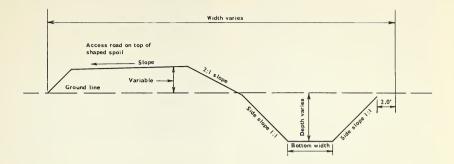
Typical Main Ditch Cross-Section Showing Basis For Determining Right-Of-Way Width
